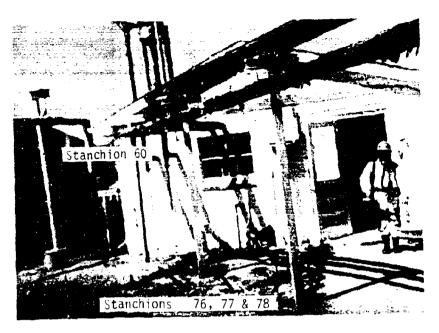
East elevation of building 753 (Stanchions 60, 76, 77 and 78 in background)
